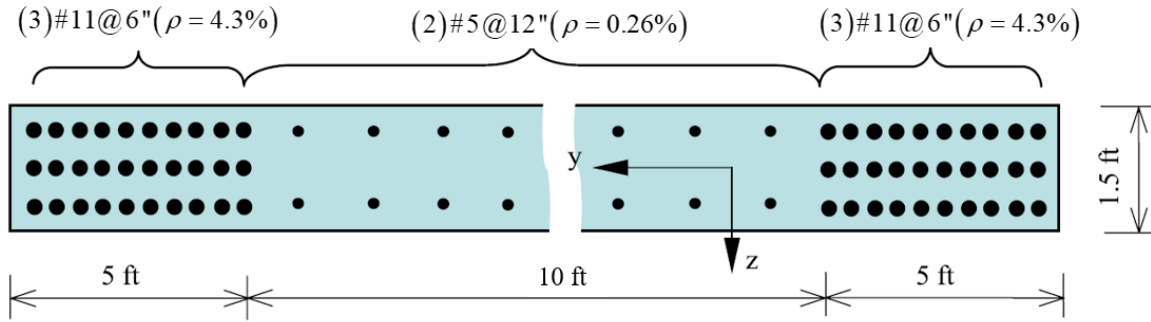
Reinforcement and geometric details of the planar RC shear wall
